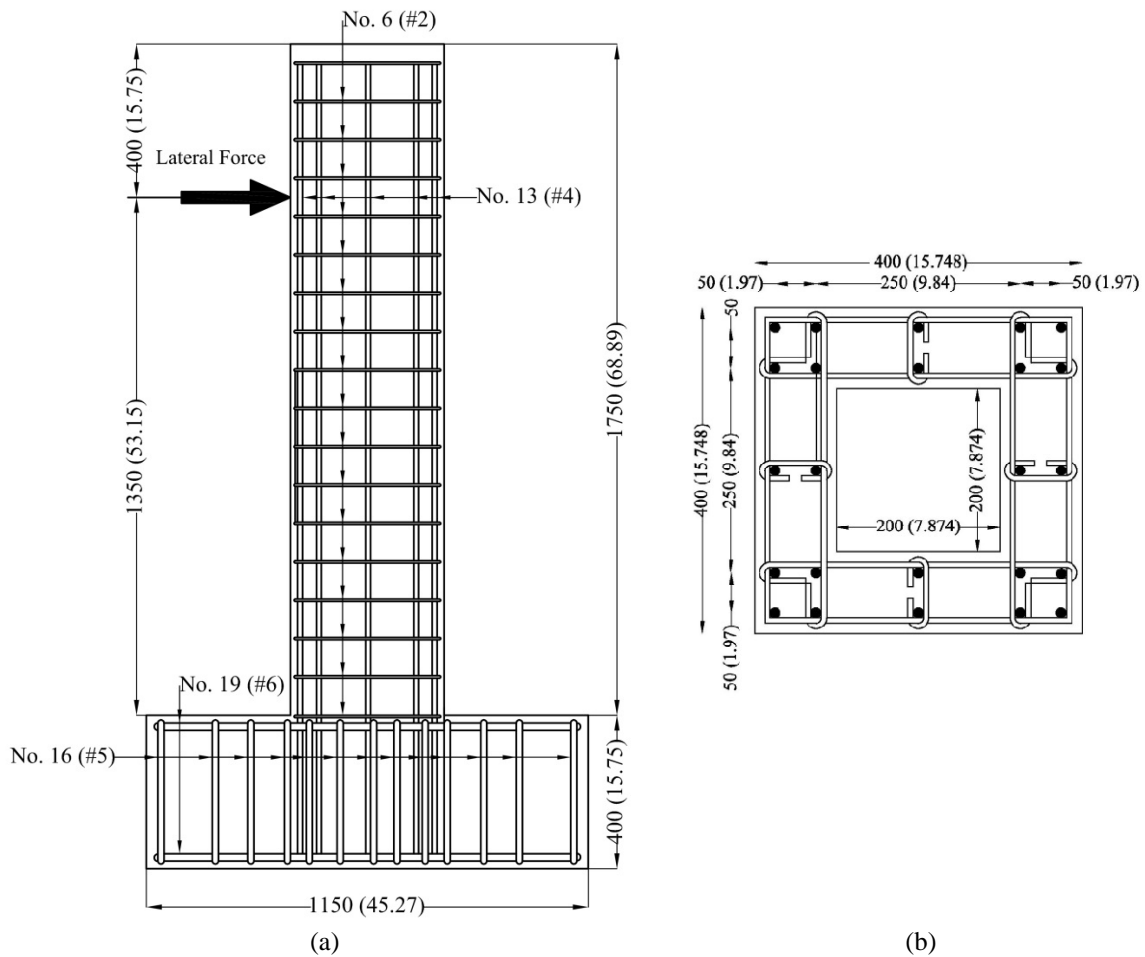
Geometry and reinforcement of the specimen TP-36; (a) Elevation, (b) Cross-section
